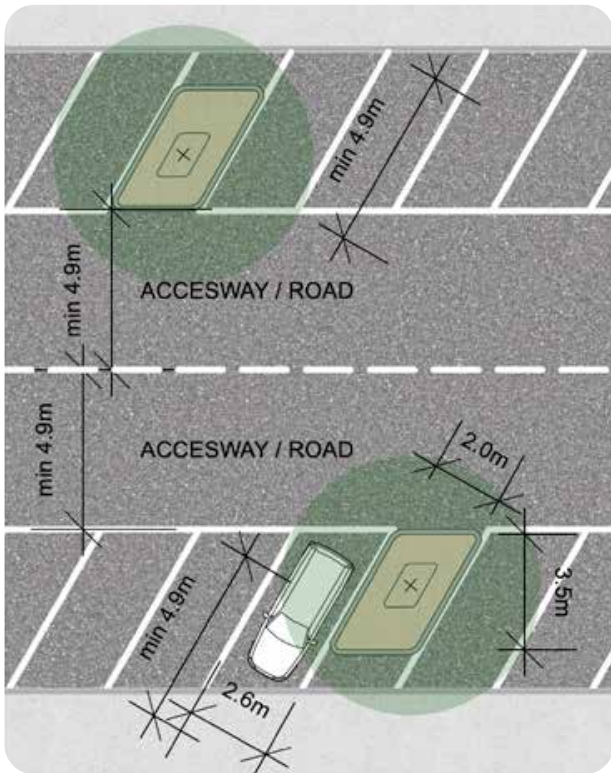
Typical layout of trees in outstand every 5 (right) car parks with 60° angled parking
